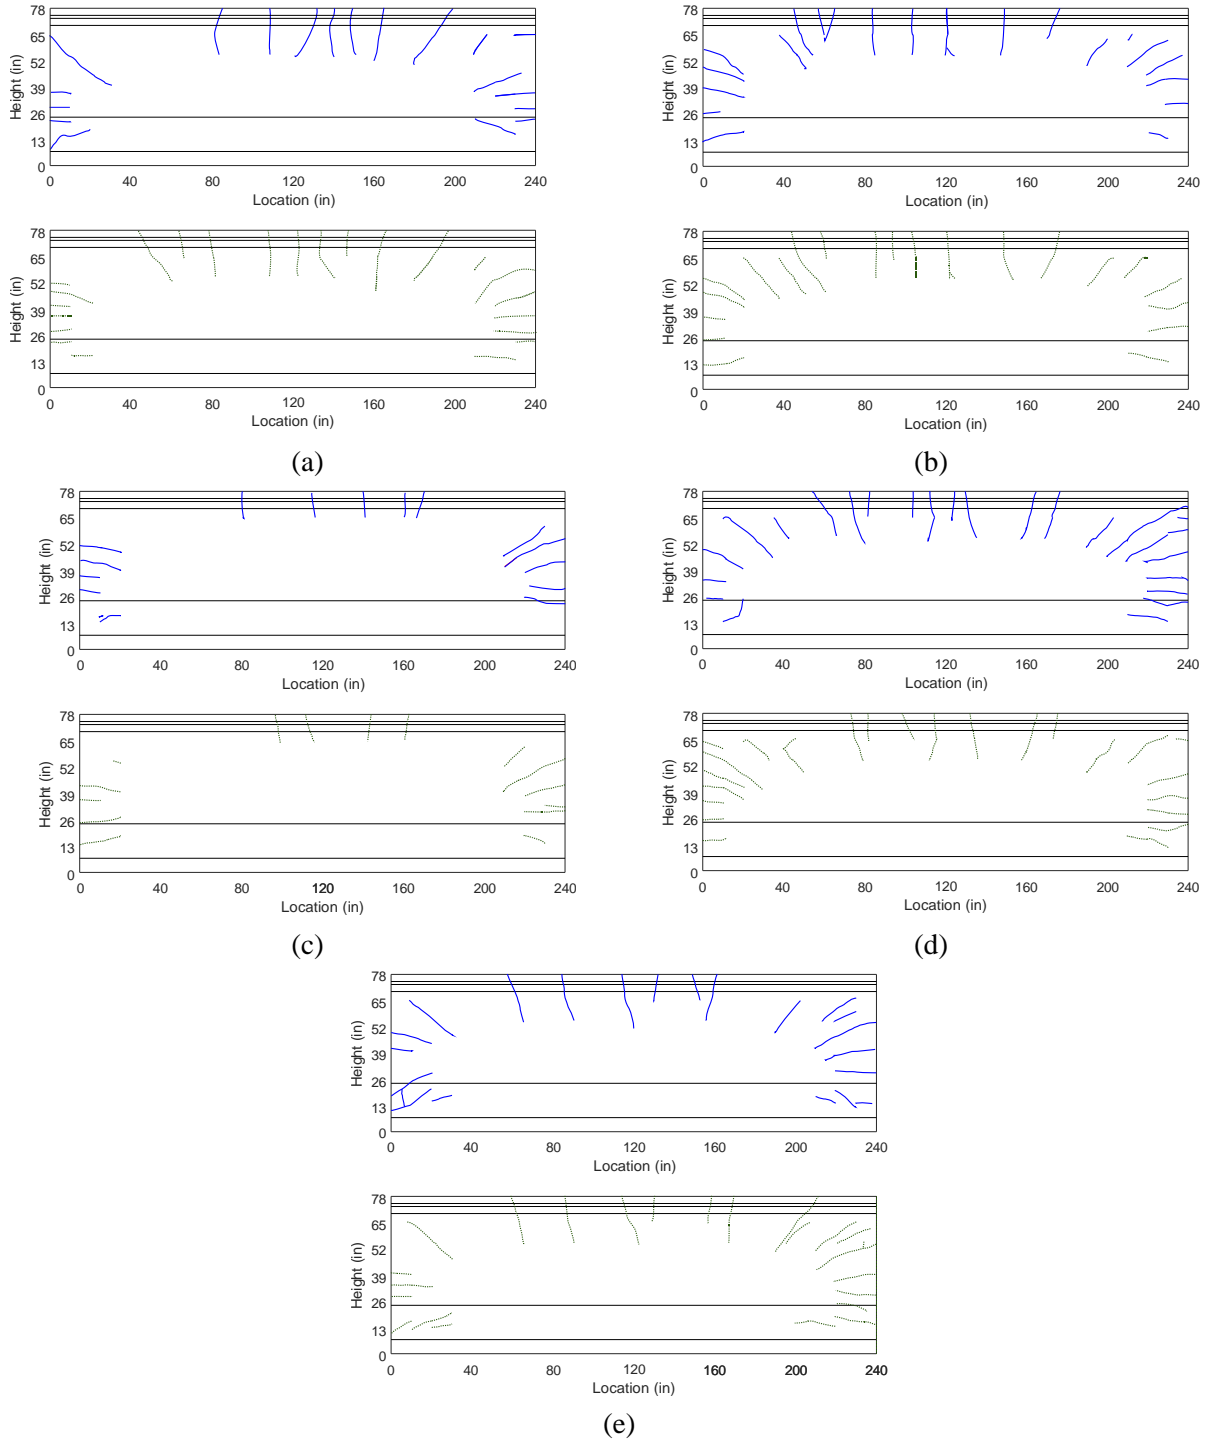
End region cracking at 28 days shown on north elevations of specimen: (a) CT, (b) SH-30, (c) SH-70, (d) CR-70 and (e) PP-50. Solid blue lines depict cracks visible on the North face and dashed green lines depict cracks visible on the South face. Origin at conventional detailing.
